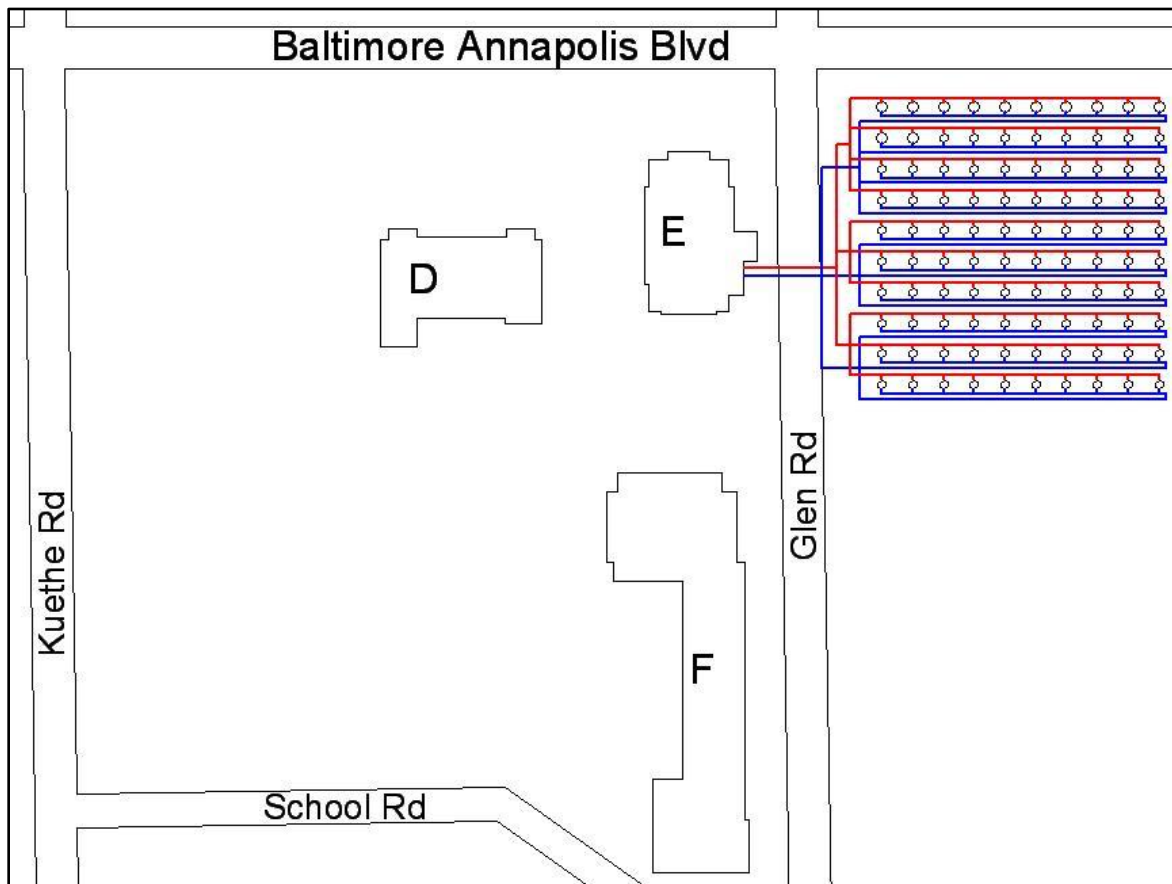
Ground Source Heat Pump Piping & Bore Layout
